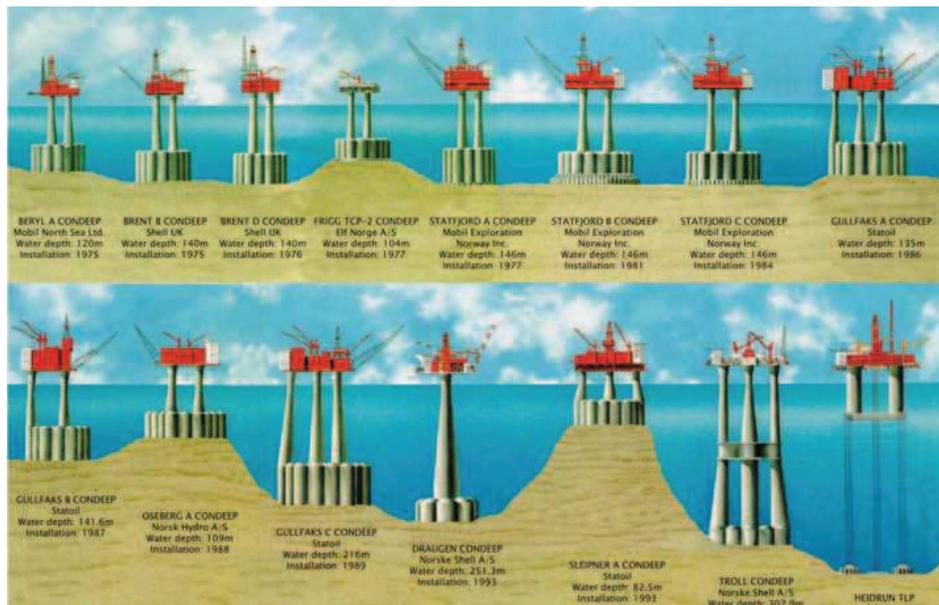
“Concrete Offshore Platform built by DNV” [29]
